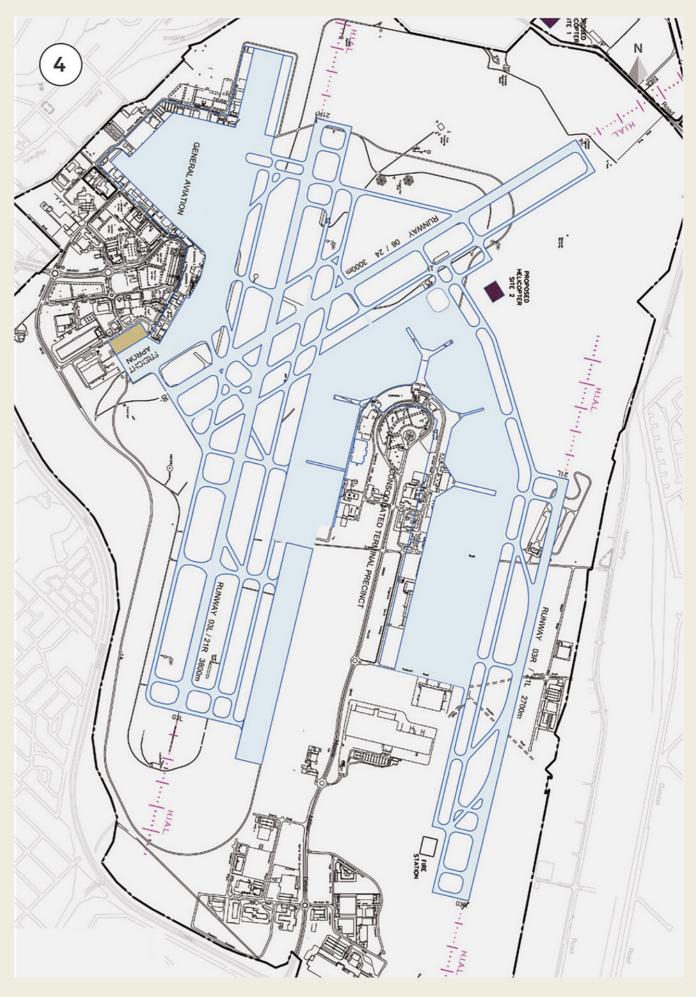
Perth Airport Airfield Layout Master Plan 2009 Source: Perth Airport Master Plan 2009
